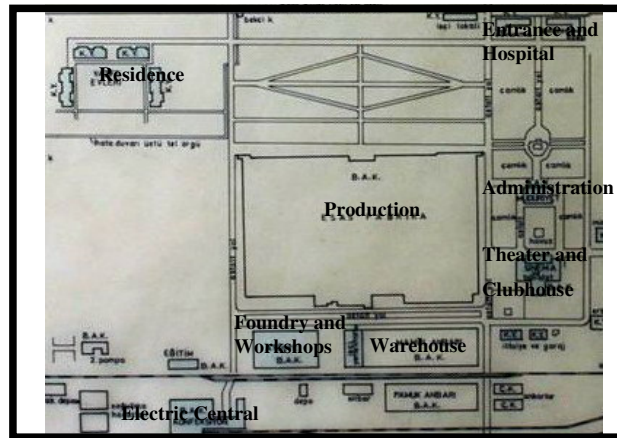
Kayseri Sümerbank Bez Fabrikası site plan in 1935⁴²
